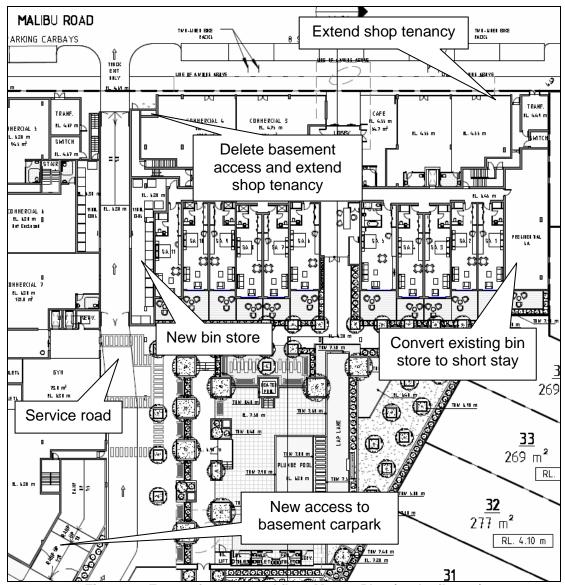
Extract from ground floor Master Plan (23 April 2012)
